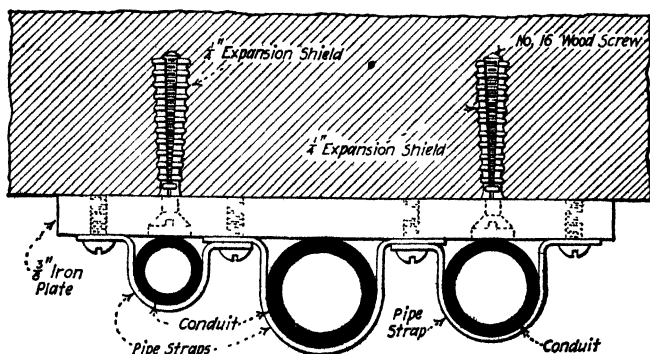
Illustrating method of fastening a multiple conduit run to a brick or concrete surface.
